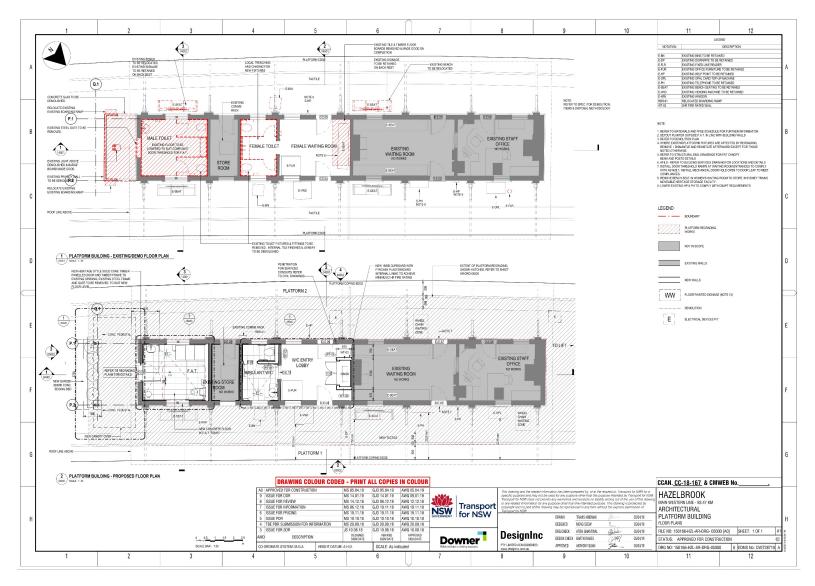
Design plan drawings for similar bathroom renovation works for the TAP Hazelbrook Station platform building
